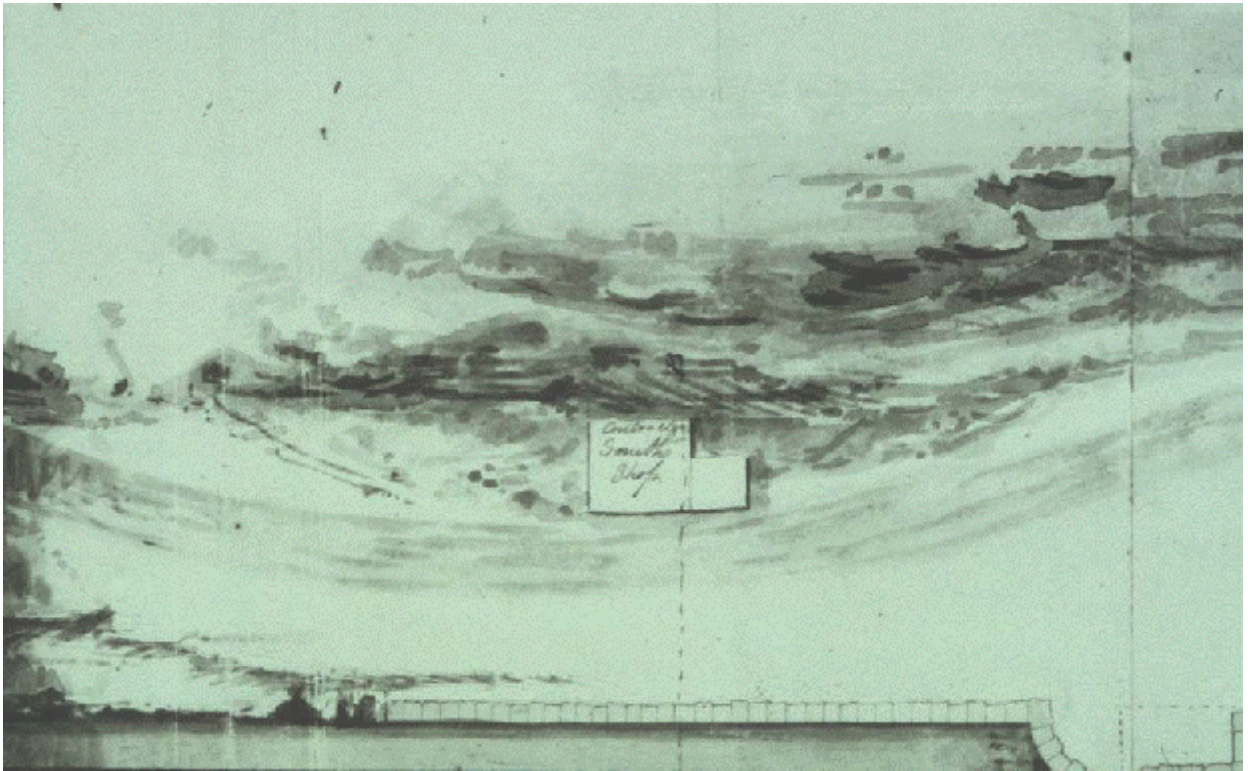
Detail from "Present State of [Works at the] First 8 Locks, Entrance Valley, Rideau Canal", 24 Oct. 1829. The Sapper's Bridge is on the left and the smithy to the right of the bridge, on the west side of the canal. (Public Archives of Canada; NMC 12892).
